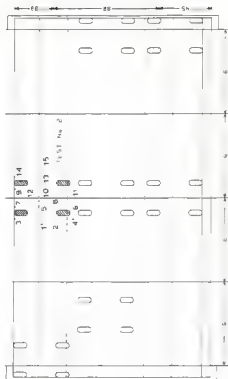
LVDT Locations (Fifth Bridge - Test No 2)
